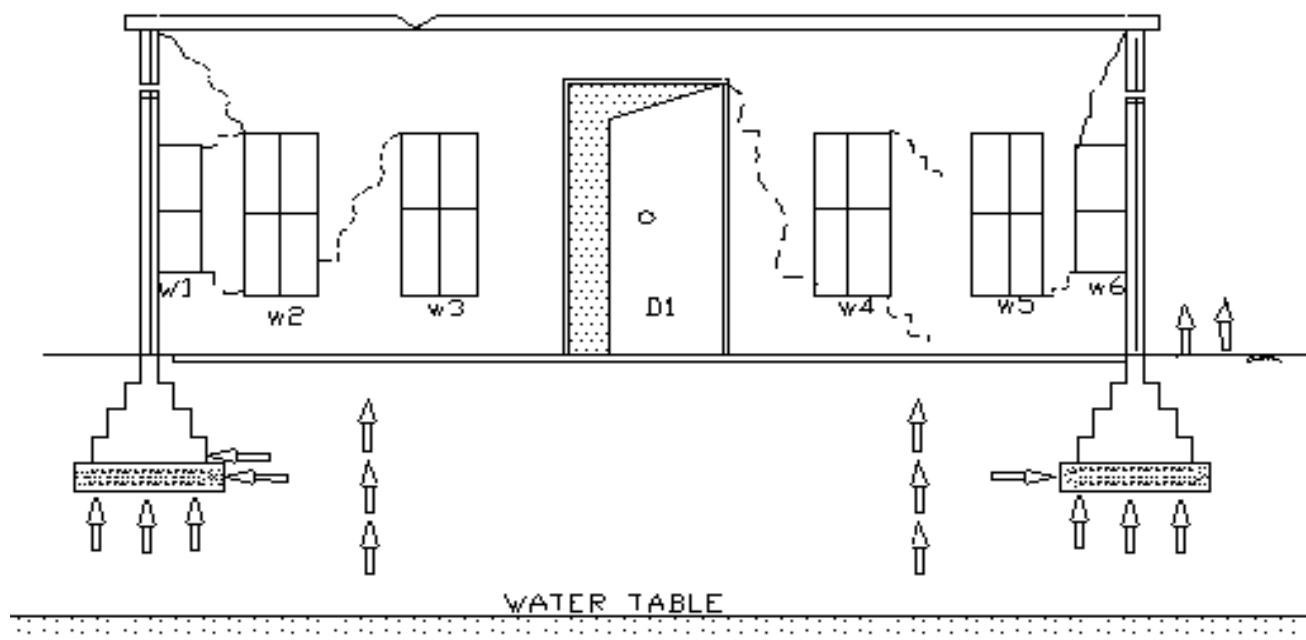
Sketch Depicting Cracks in Exterior Wall
